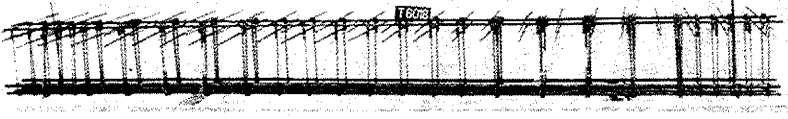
Completed reinforcement for Beam No.T6018
